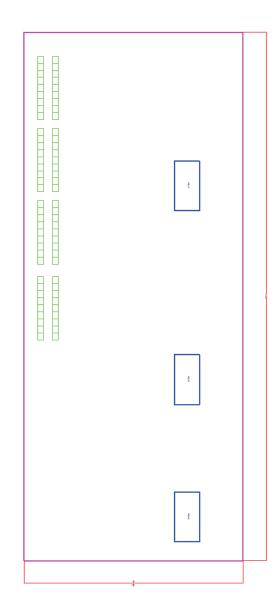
LOWER ROOF PROPOSED LOCATION FOR REMAINING PUMPS
